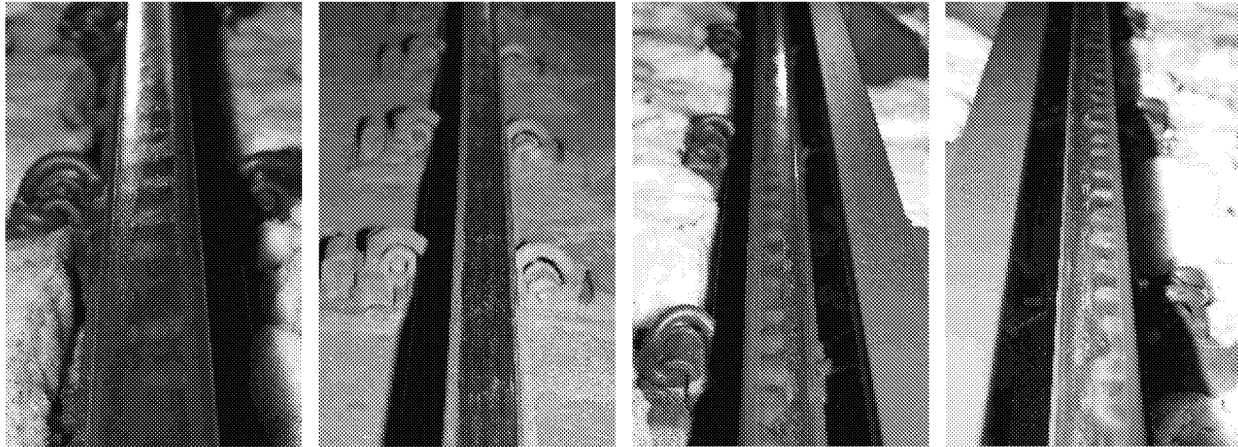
Example RCF (not from Confederation Line) of gauge corner cracking (left image) and top of rail surface defects (right image)
